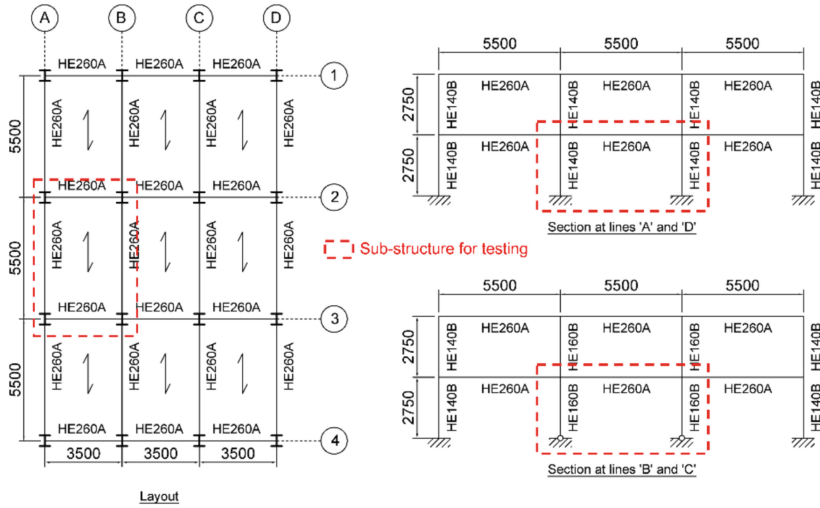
Layout and section views of the case study steel frame (units in mm).
